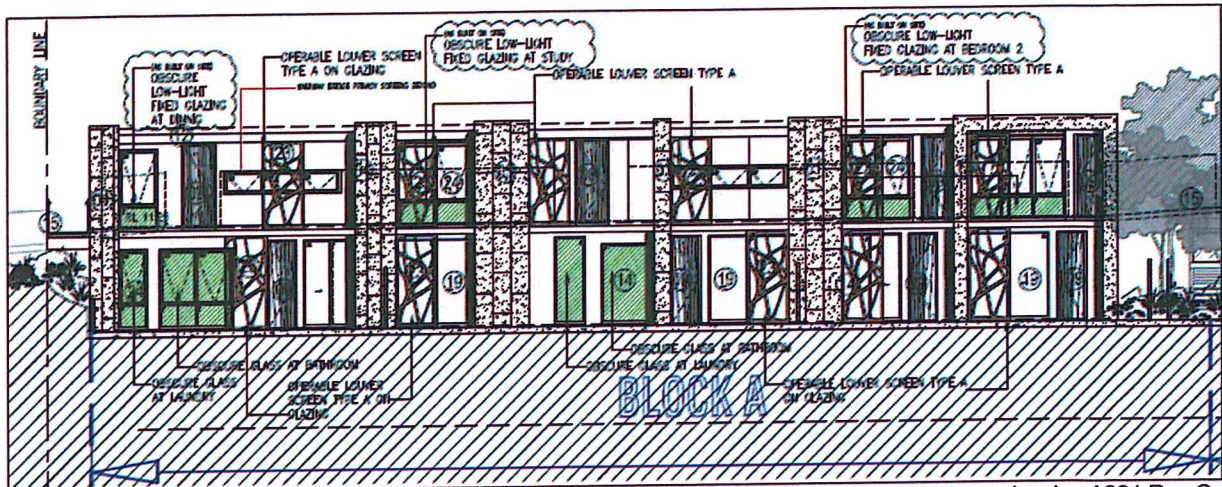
Proposed obscure glass to south facing windows in Block A (source: tony owen partners drawing A201 Rev C, dated 21.4.2015).
